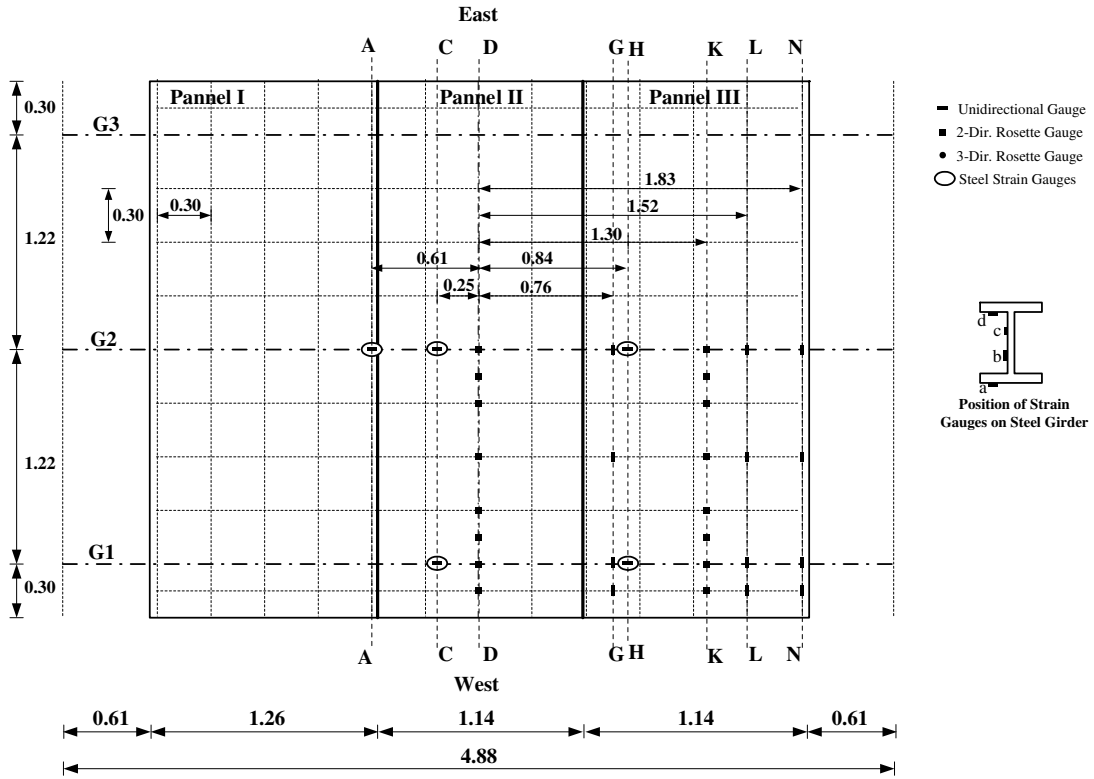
Strain gages locations for deck top surface and steel girders (dimensions in metres).
